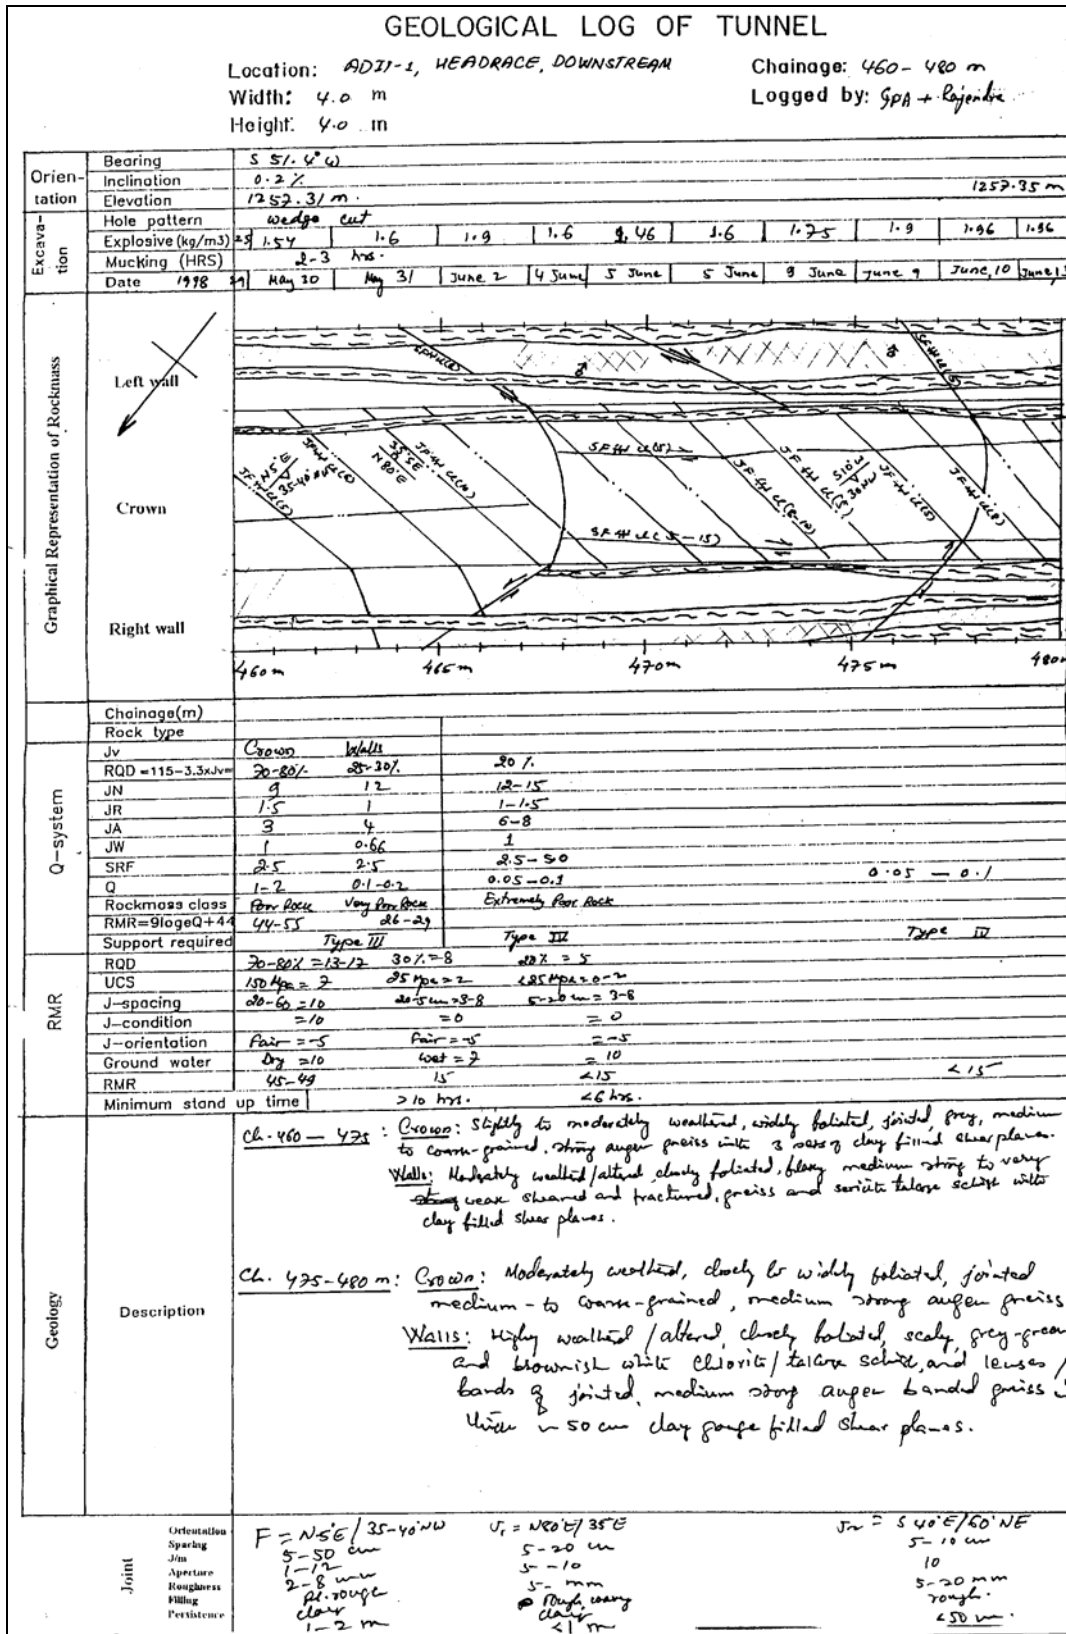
A typical 'Tunnel log' of Khimti headrace tunnel.
